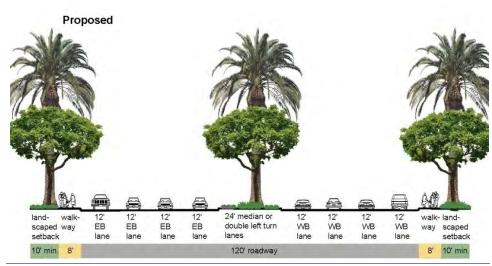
B Crown Valley Parkway: Cross Sections—Looking West
